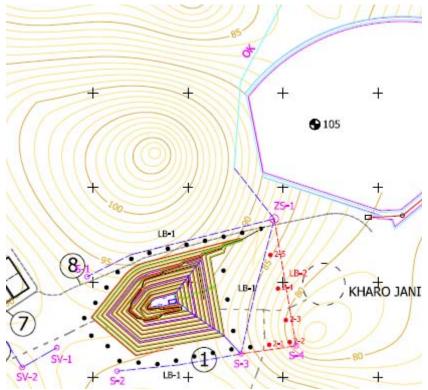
Plan of Dewatering in Stage 1 of the Mine Opening
